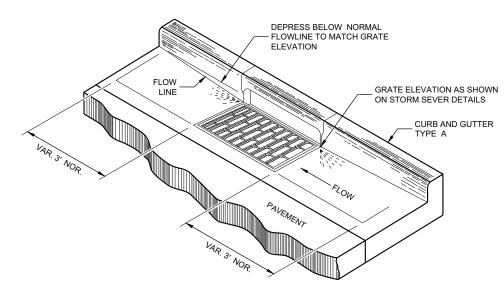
DETAIL OF CURB AND GUTTER AT INLETS (TYPICAL H INLET COVER SHOWN)
